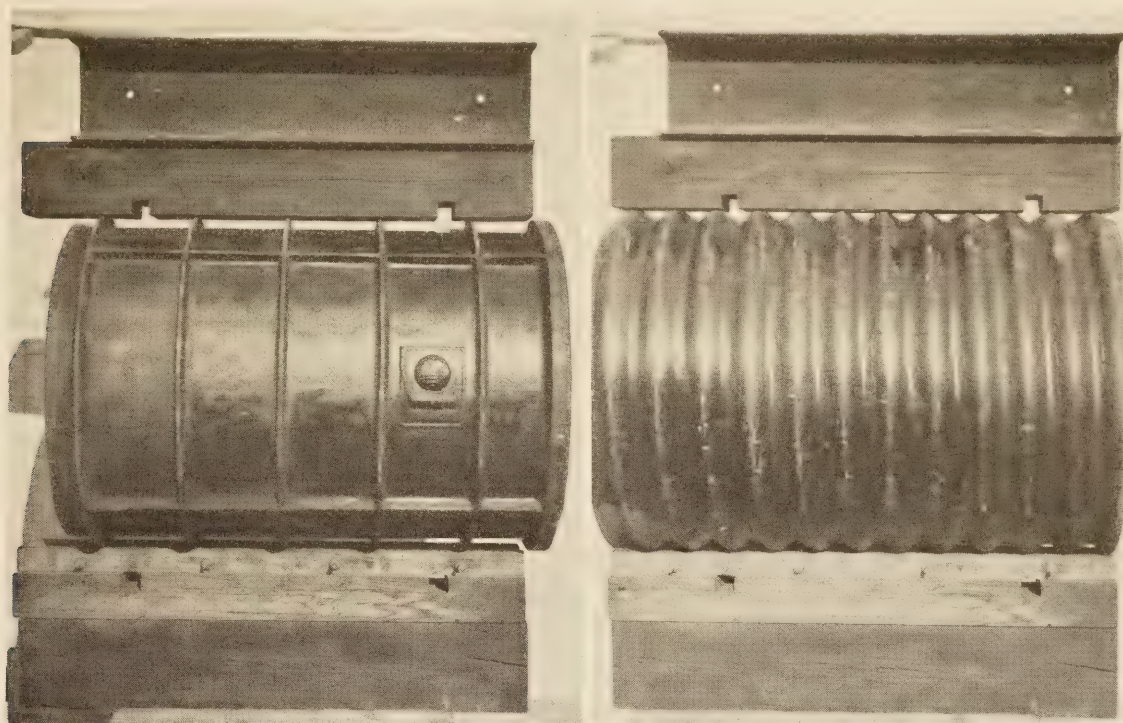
RIBBED PIPE AND SPIRAL-CORRUGATED PIPE WITH BEARING BLOCKS USED IN 3-EDGE BEARING TEST.
